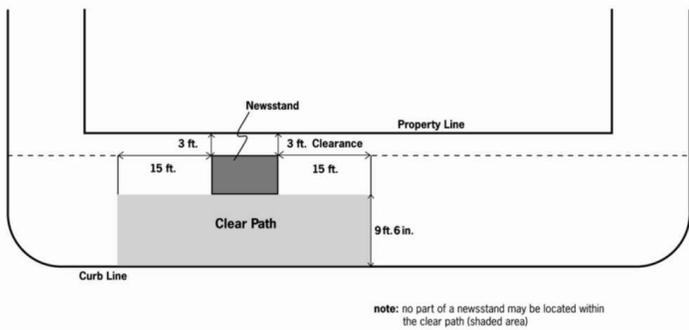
Typical full block front plan showing clearance from corners and curb of streets.
